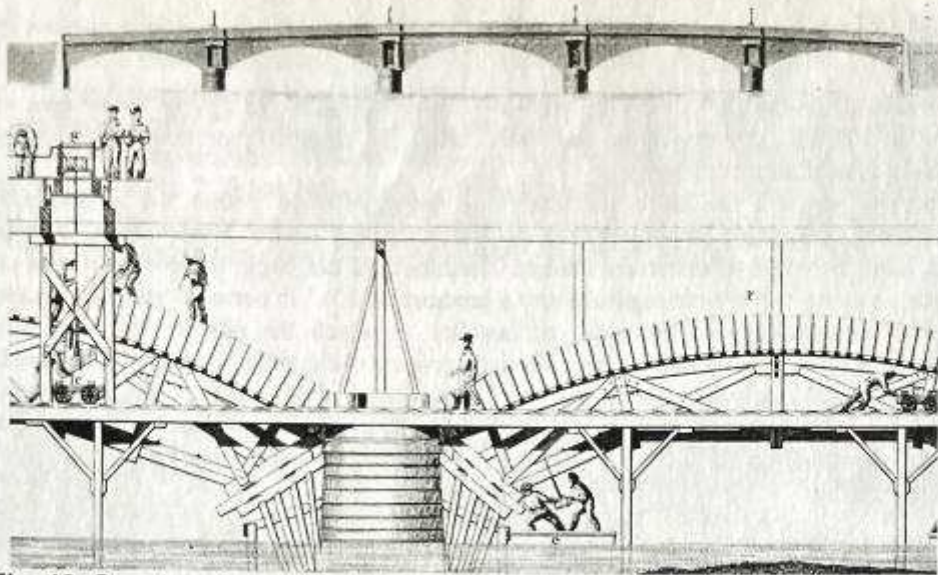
Construction railway in use at Hutcheson Bridge, Glasgow 1831-34
